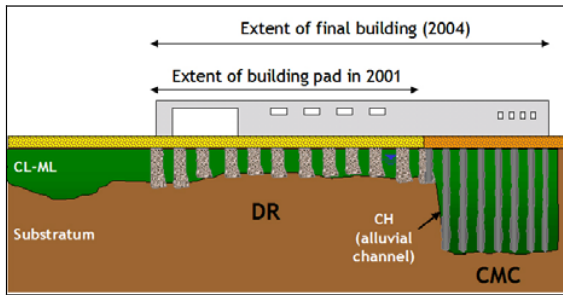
Schematic of soil profile & foundations system at Bermuda street (QLD)
